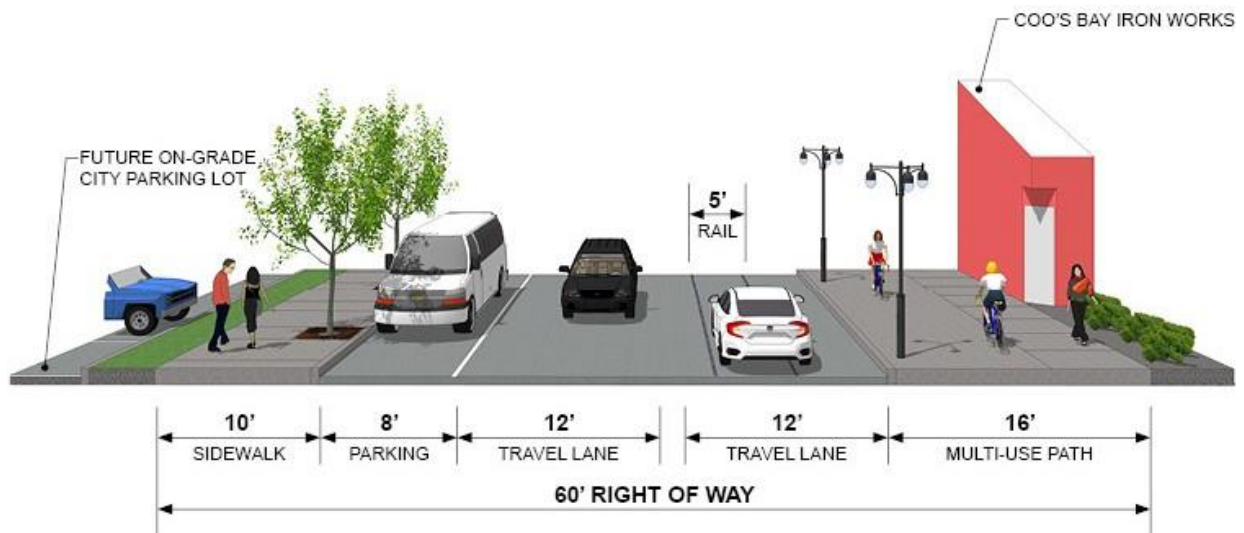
Alternative 1 - Proposed Section B (Date Street to Cedar Avenue)
